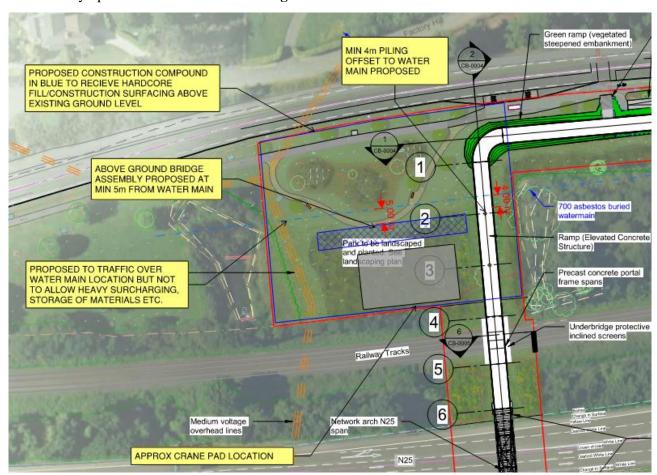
Proposed easement to underground water main running through bridge assembly area
